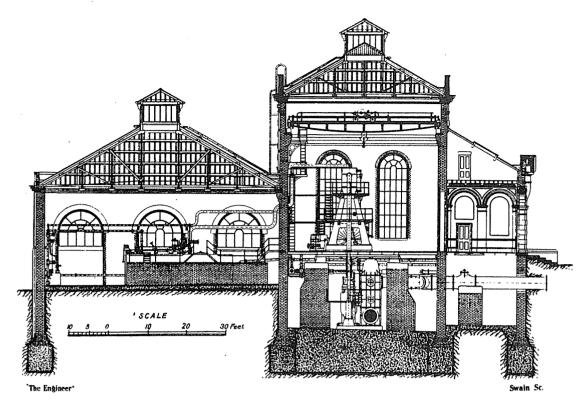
Section through typical early 20th century pumping station: Kempton Park which housed five Lilleshall triple expansion engines, installed 1908, scrapped 1973 (The Engineer, 1908, 106, p.424)
